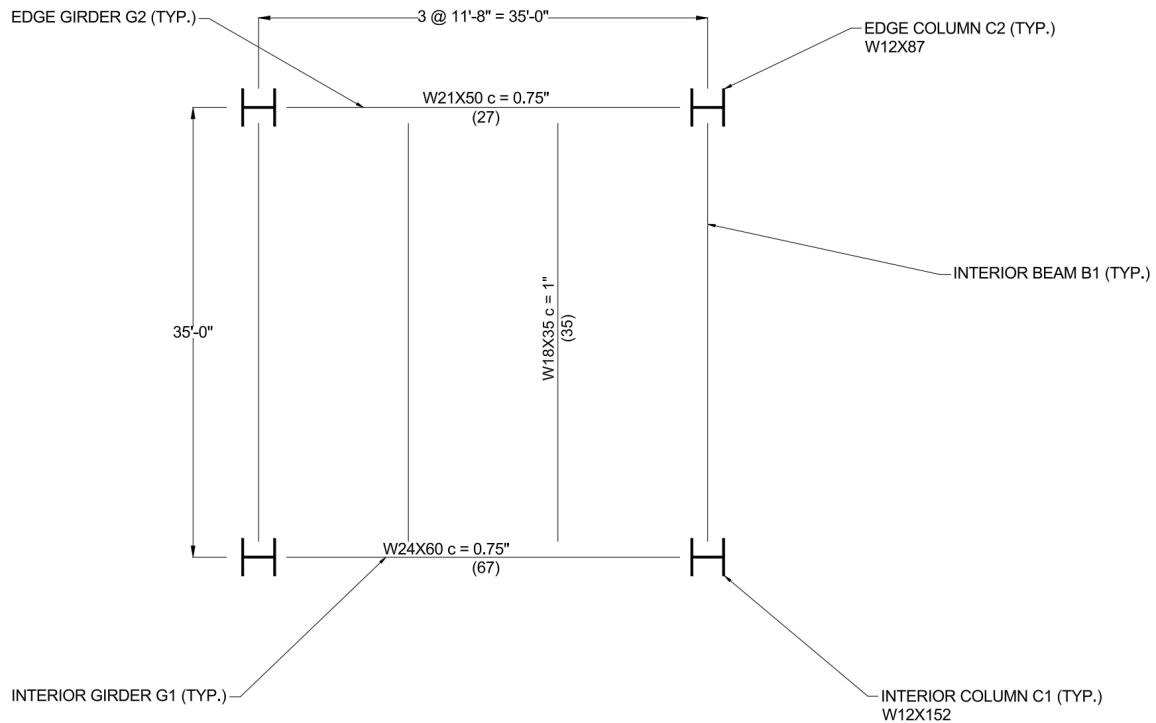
Summarized Beam and Girder Plan Layout
